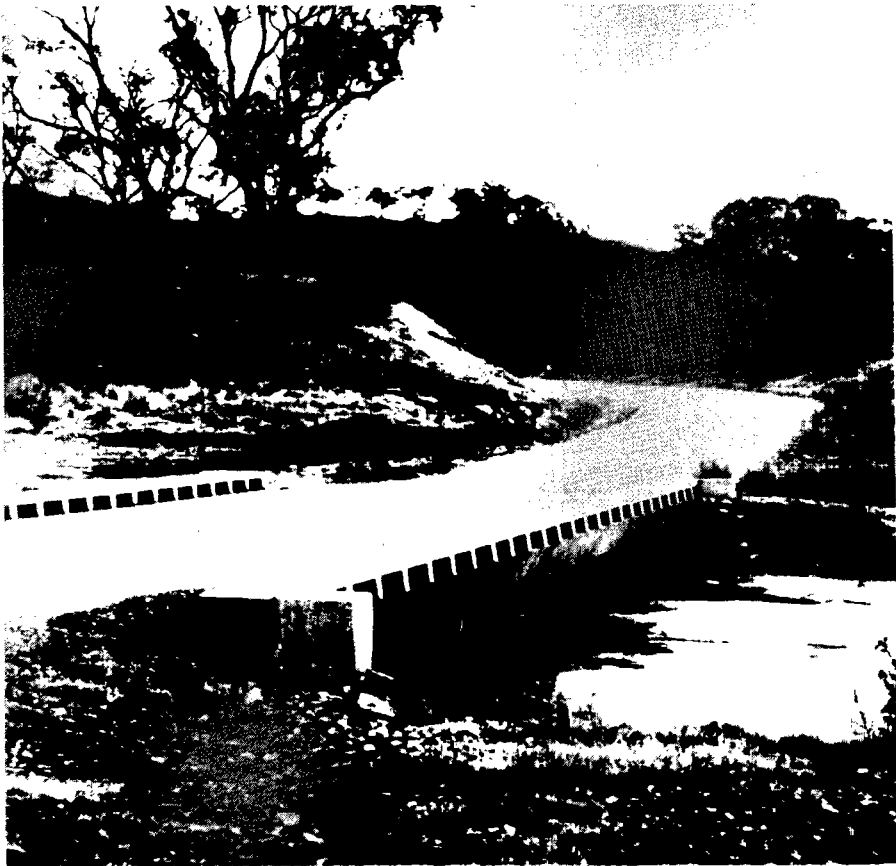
Bridge across the Lachlan River, Bulley's Crossing
